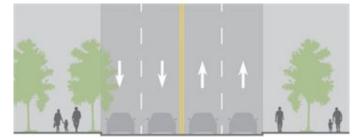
| Alternative 3 cross-section of Spring Hill Road from Tyco Road to West*Park Transit Station Terminus
